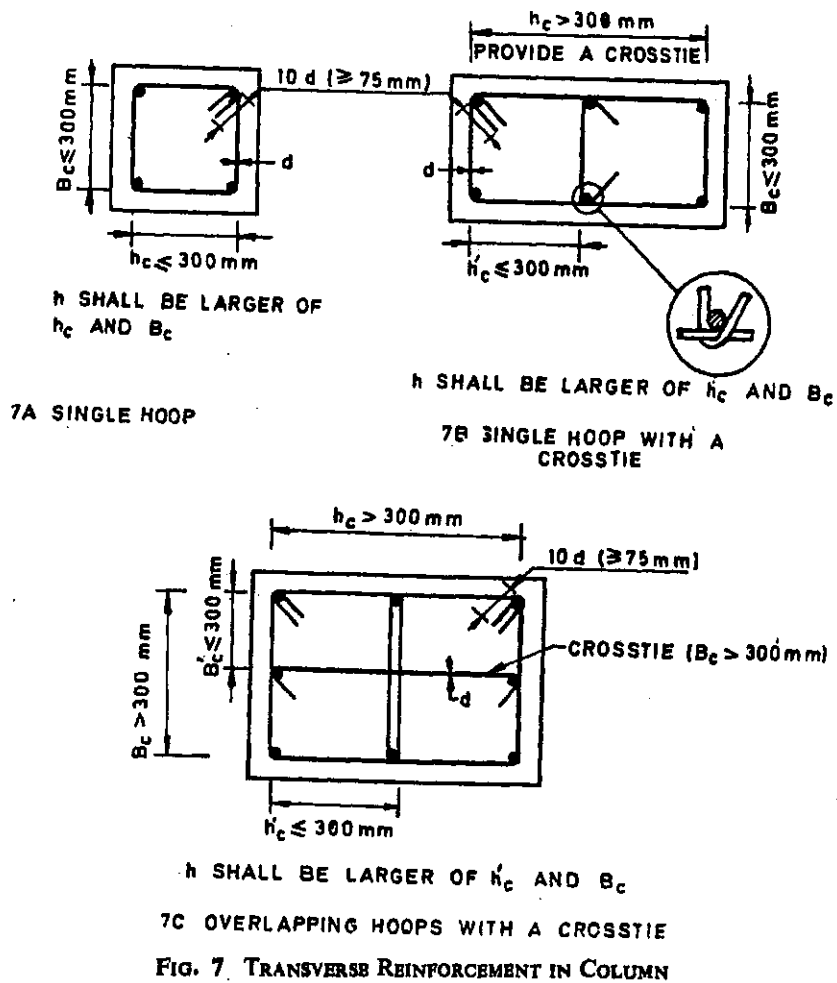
TRANSVERSE REINFORCEMENT IN COLUMN
